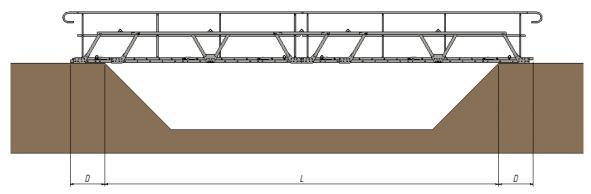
Footbridge of two stair flights reinforced with a truss.
